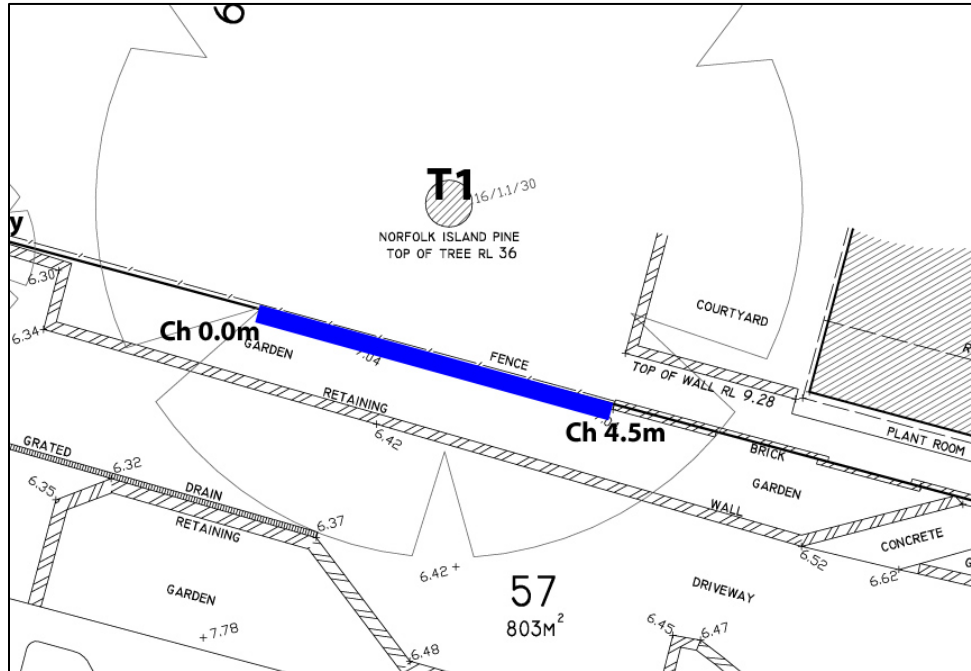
Figure B: Excerpt from the Survey Plan showing the location of exploratory excavation (blue line).
